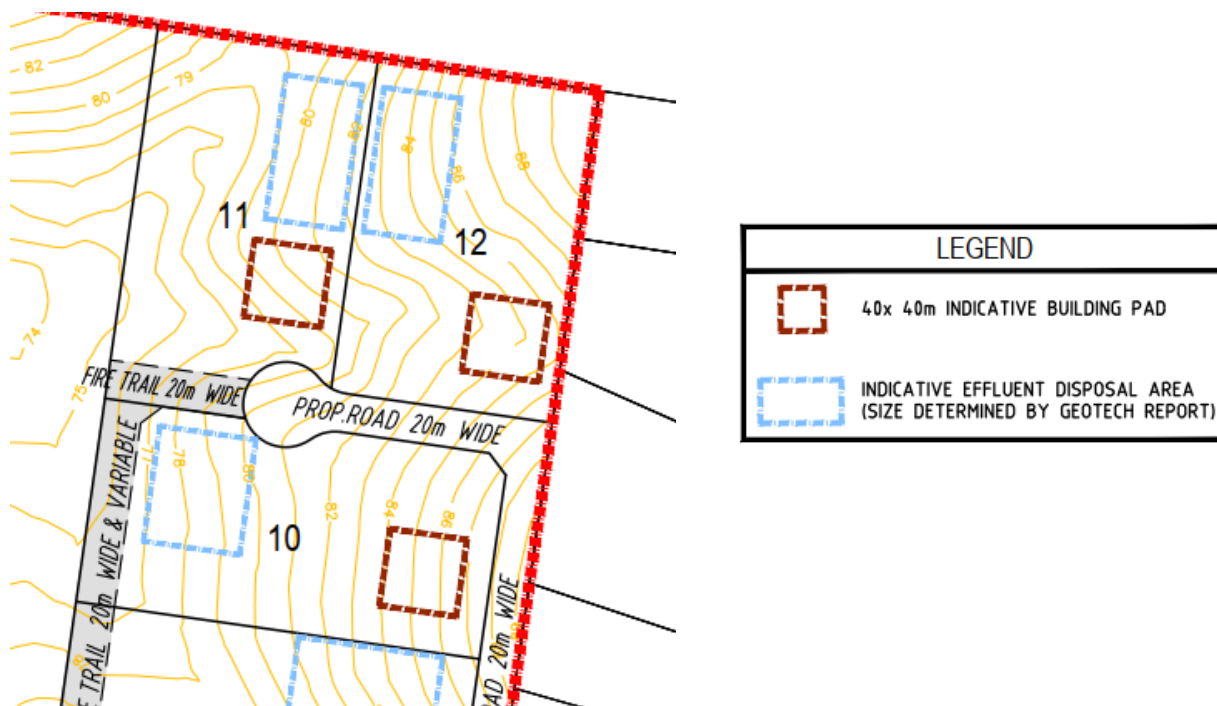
Indicative Building Pad Locations with Effluent Disposal Area
